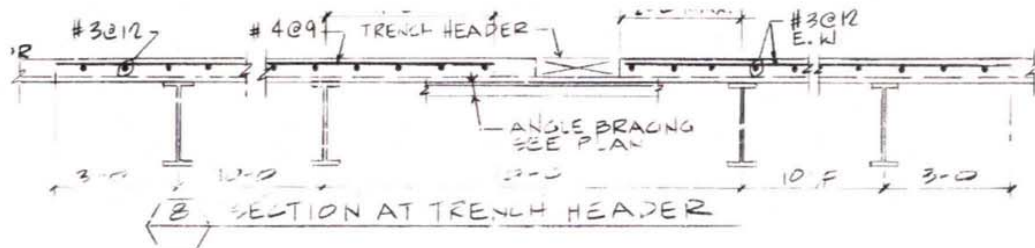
Section View of Trench Header Detail showing Bracing on a 1978 project in Houston Texas, designed by CBM Engineers
